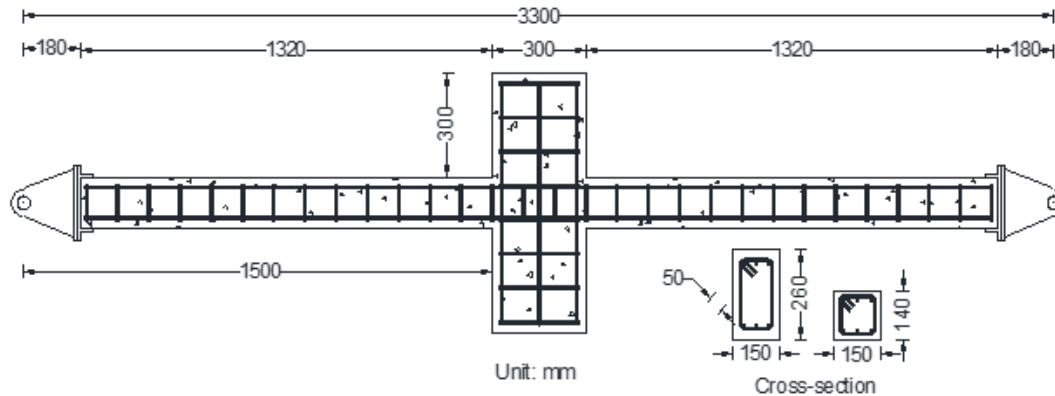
Specimens details of slender column (Caballero-Morrison et al. 2012)
